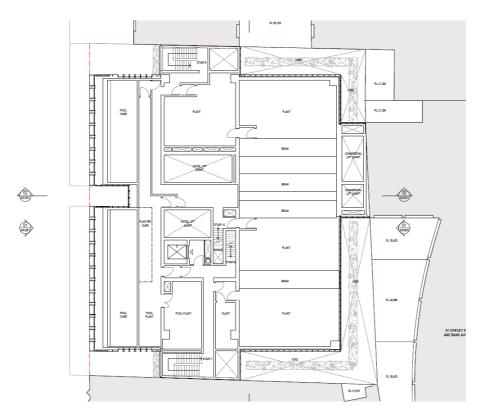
| Proposed level 11 (Source: Woods Bagot)
